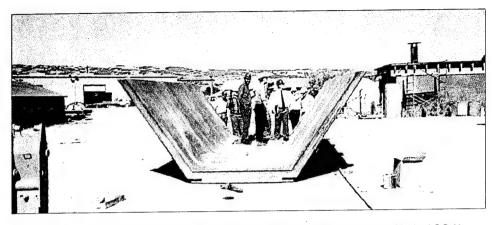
Precast concrete sections, El Dorado Flume (from Firth 1994)
